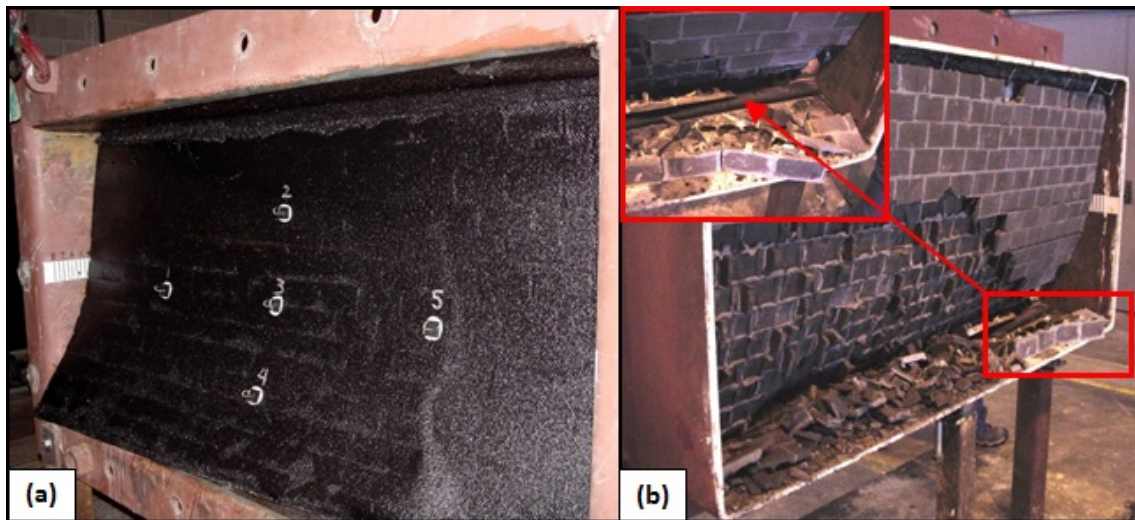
SW8. (a) Posttest photo of Wall SW8. (b) Failure occurred when the elastomeric material peeled off the bottom support.
